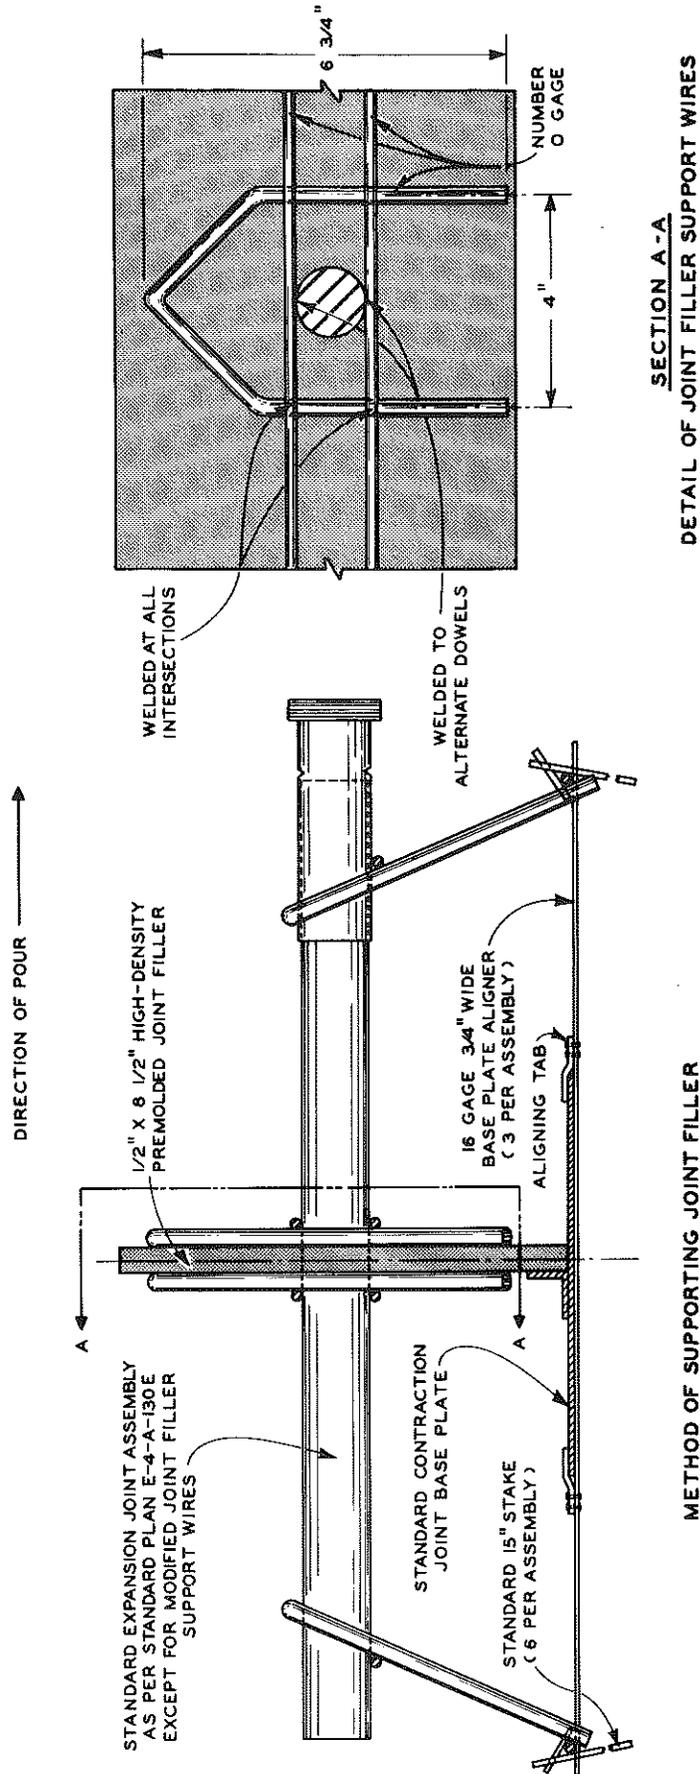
Method of supporting joint filler and detail of joint filler support wires.
